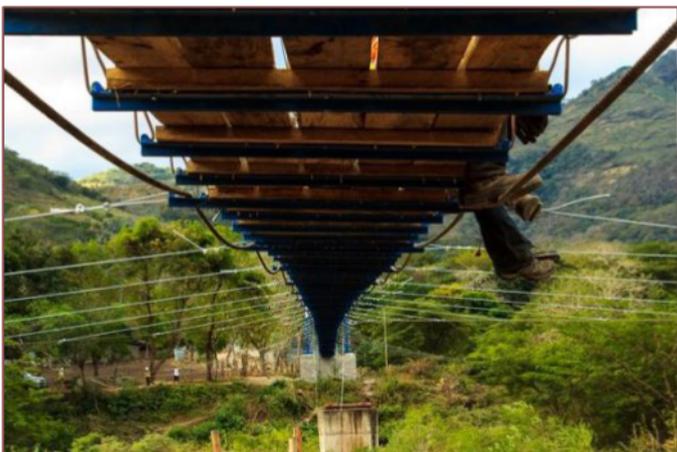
Walkway and guy wire installation is complete, and fencing is installed
